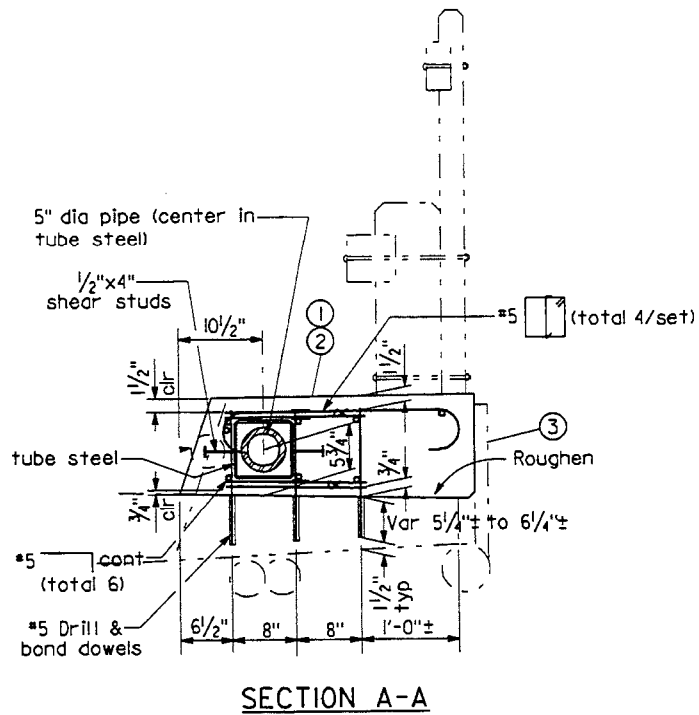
Steel Girder Hinge Shear key in Sidewalk on Concrete Deck
